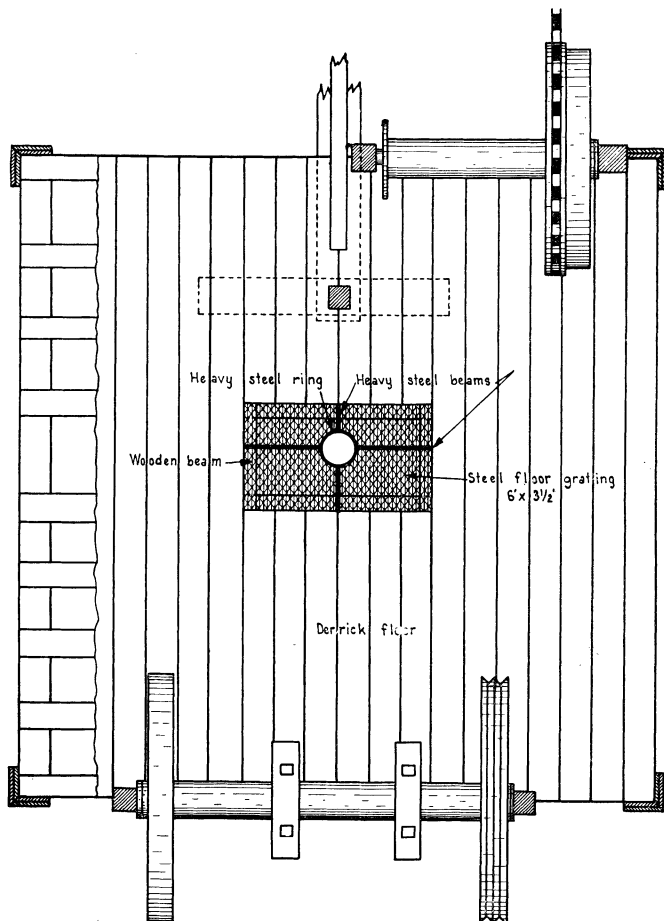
Steel flooring surrounding wells to eliminate the accumulation of paraffin and oil on derrick floor
